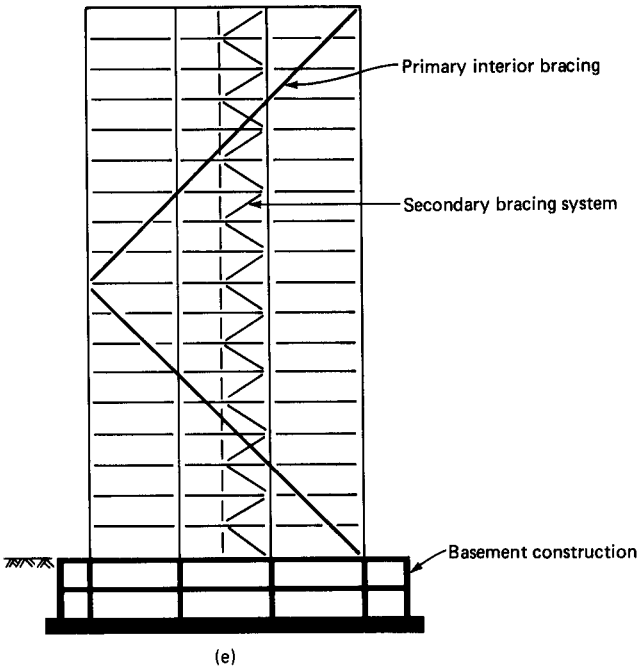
(Continued) (e) Transverse cross section showing primary interior bracing, secondary bracing, and basement construction.
